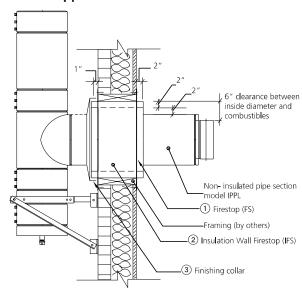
Typical Insulated Wall Firestop (IFS) installation for exterior wall application IPPL model
